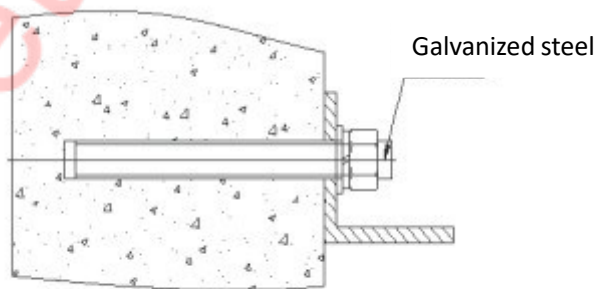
Mode of Connection between Wall and Mast tie of Construction Hoists
